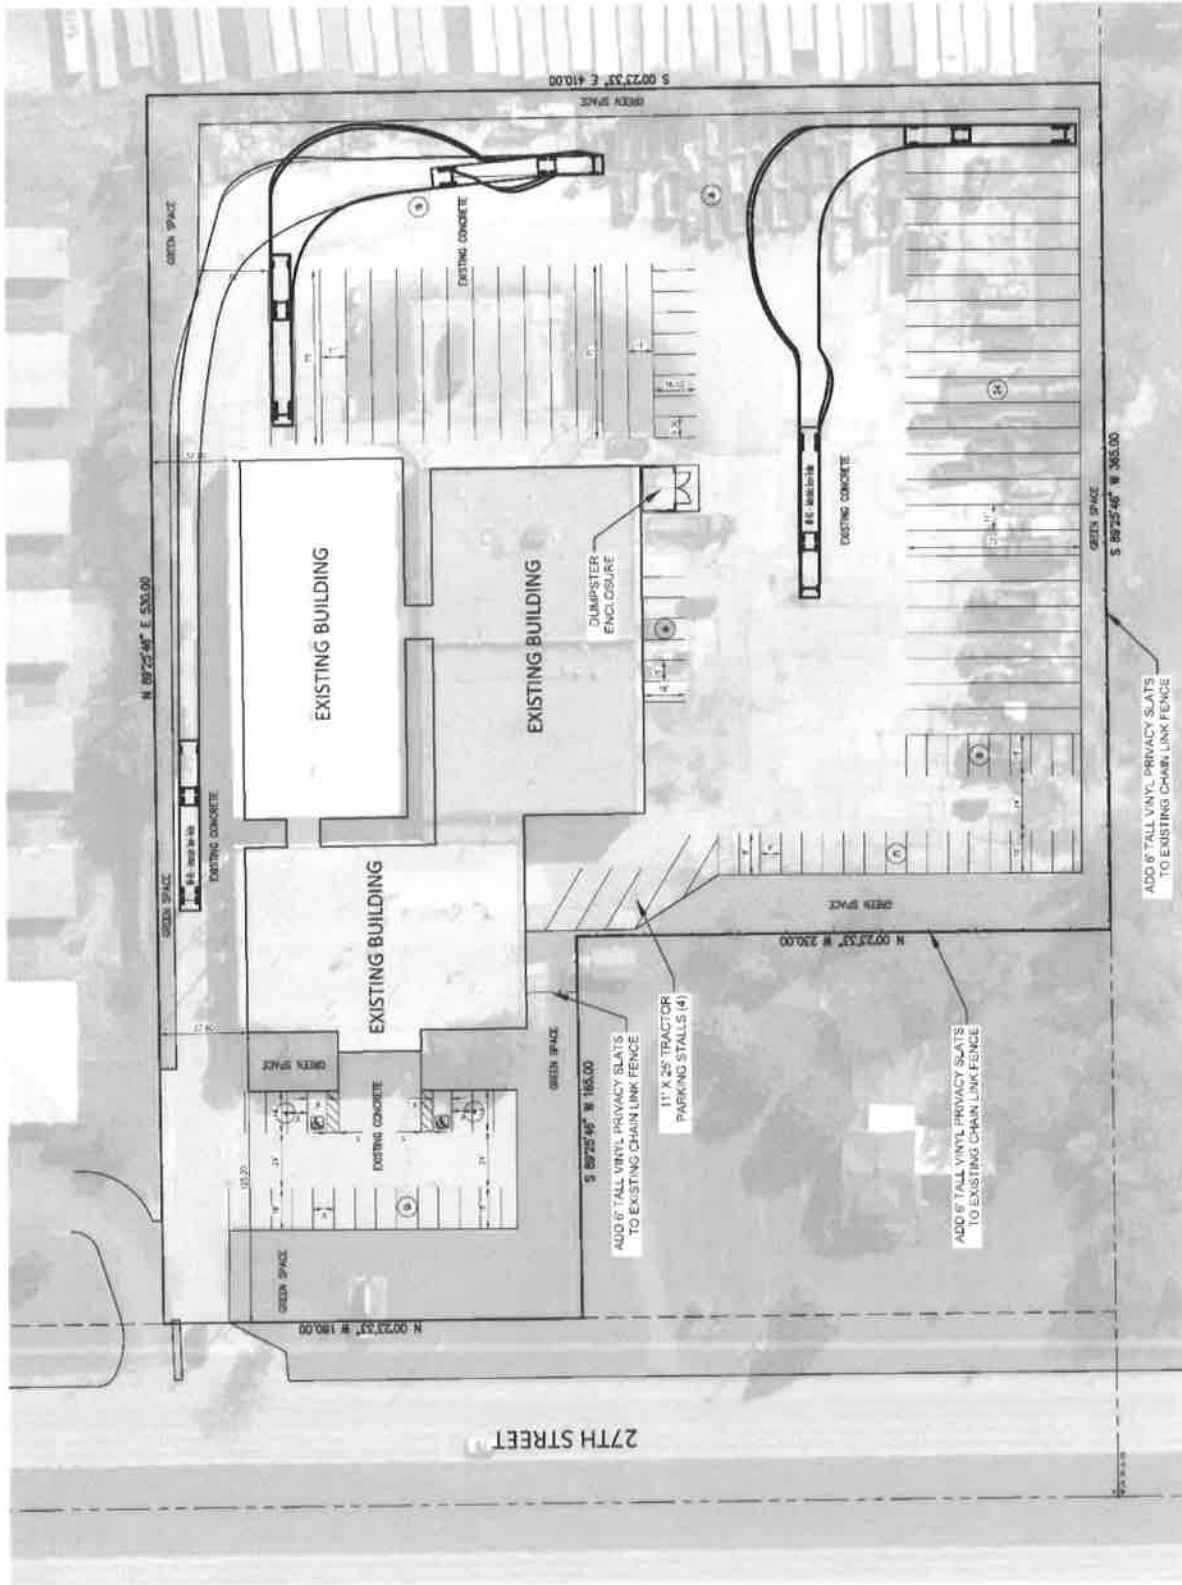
EXHIBIT C: CONCEPTUAL SITE PLAN – OUTDOOR STORAGE FOR TELCOM
